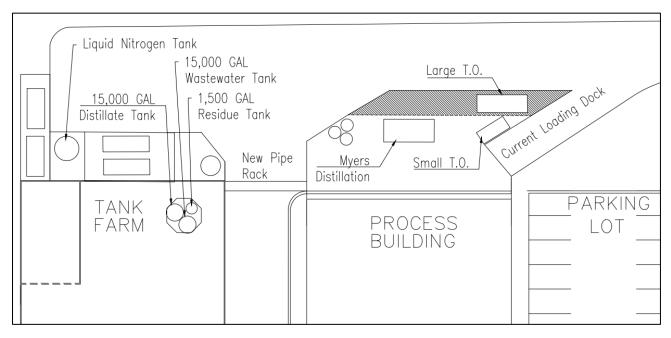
Proposed Site Plan for Distillation Systems at Ever Cat Fuels
